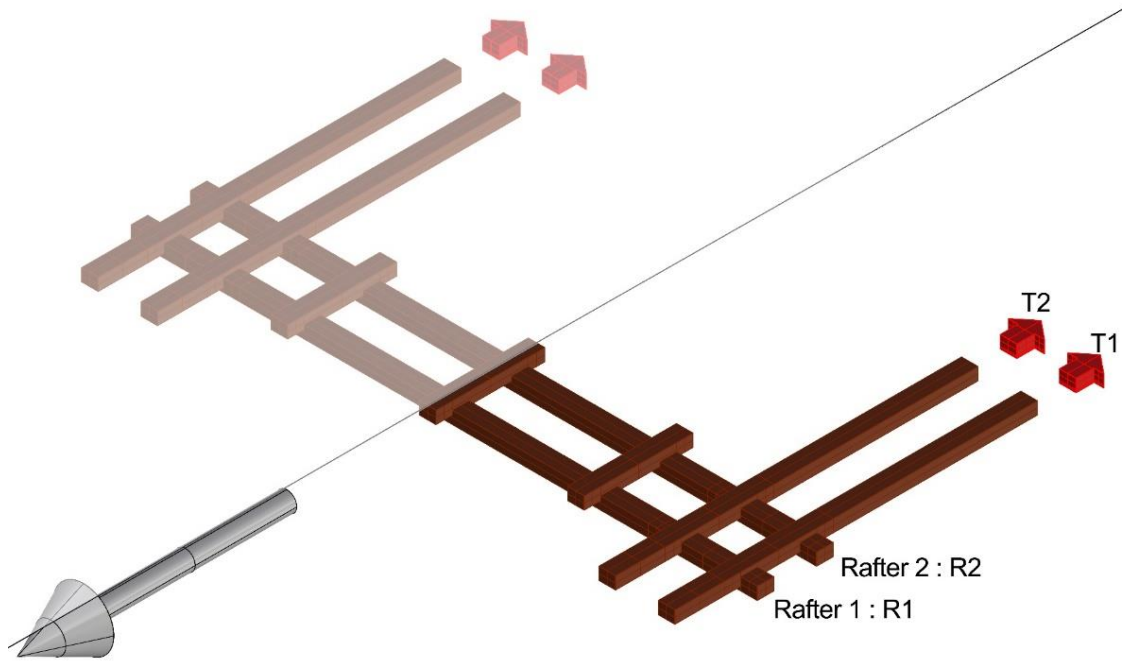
Descriptions of the rafters crossed at the roof timber beam
